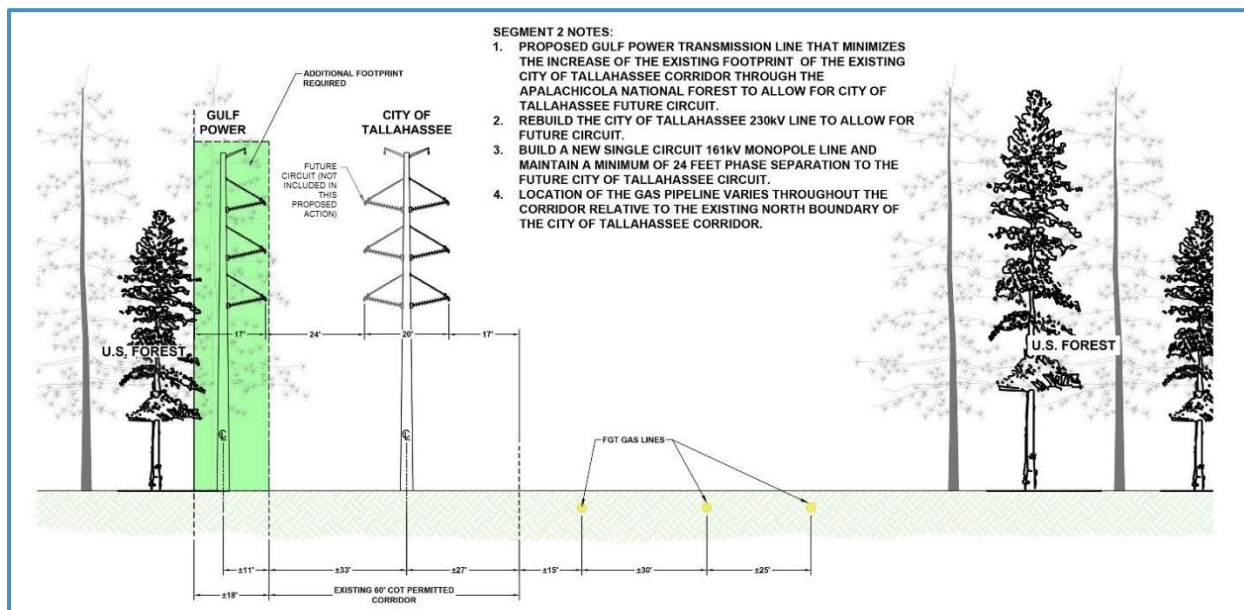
Segment 2 Corridor Cross Section Looking Northwest
